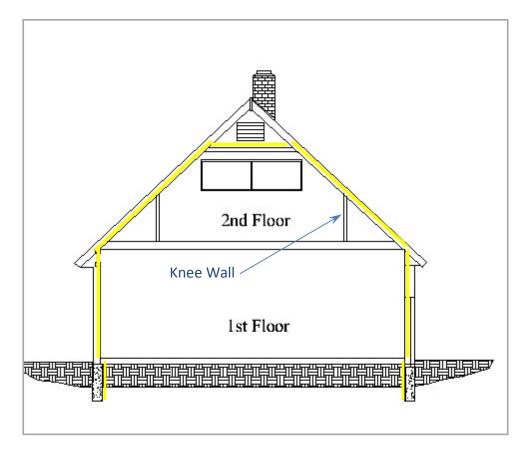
Insulation Envelope Used by Levitt for Cape Cod Style Models
